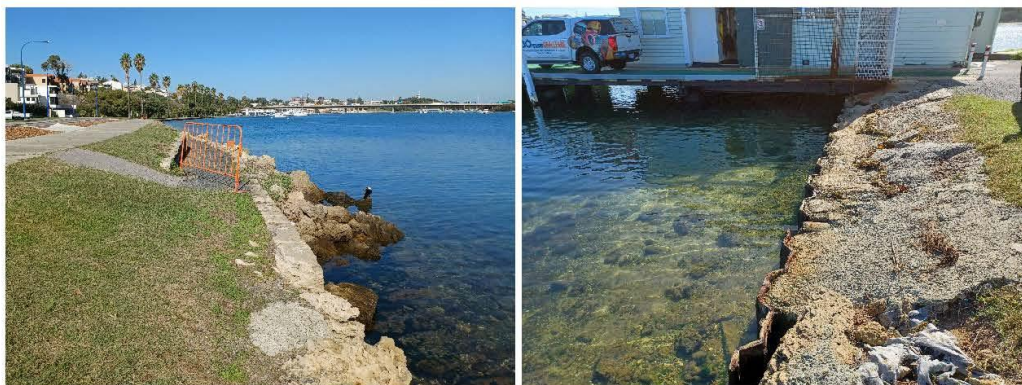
Tie In (L) & Sheet Pile Wall (R)
